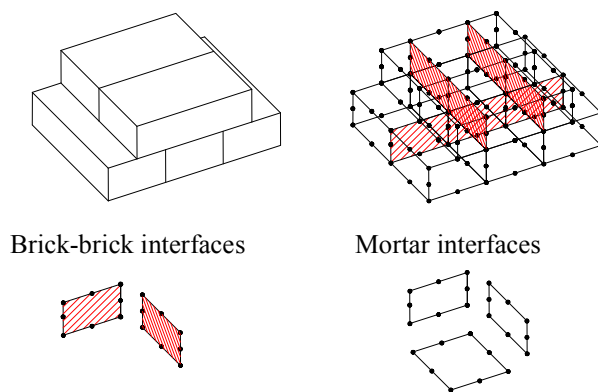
Portion of a brick wall with flemish bond and relevant FE modelling.
